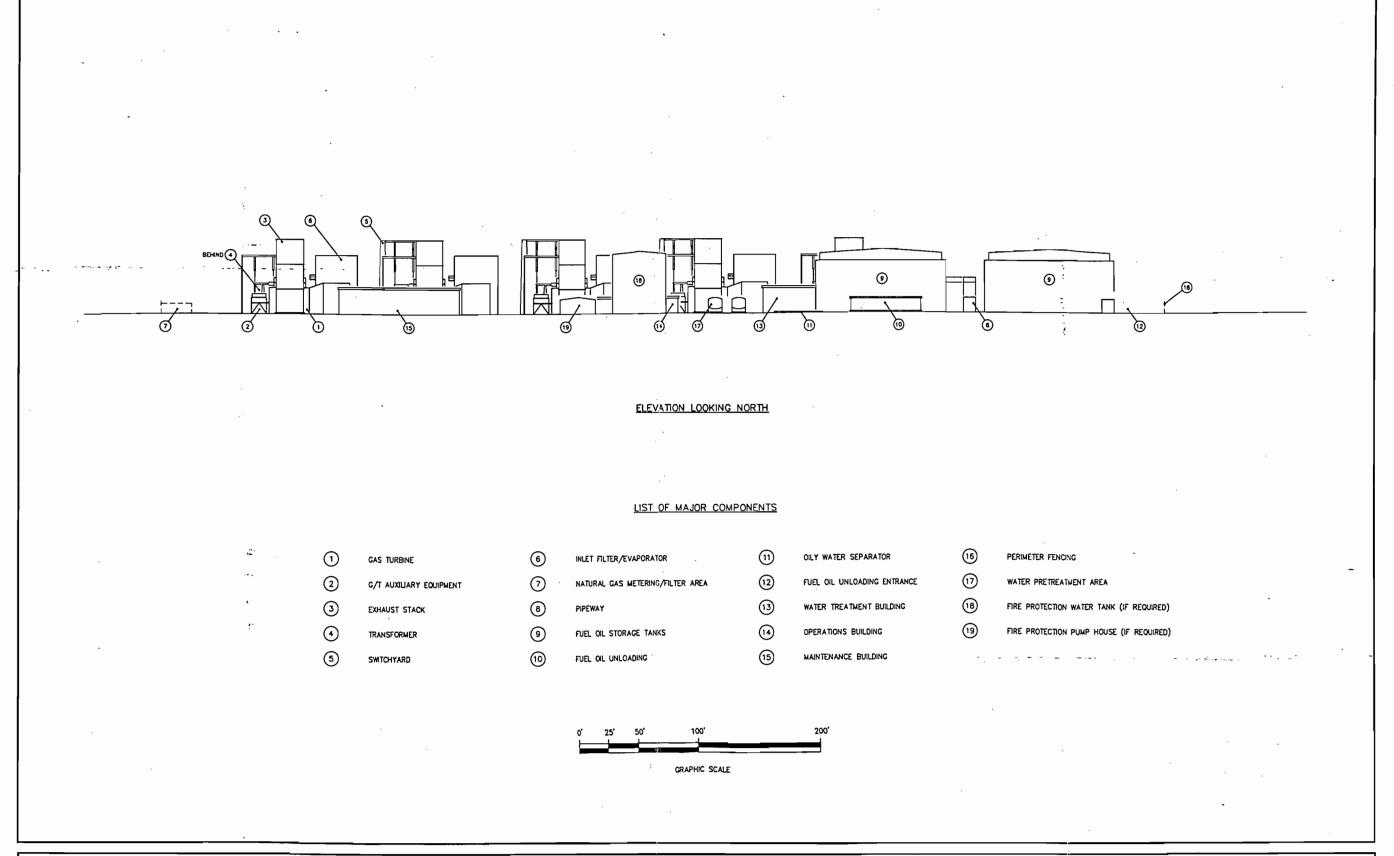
SITE PLAN FOR THE PROPOSED OLEANDER POWER PLANT
